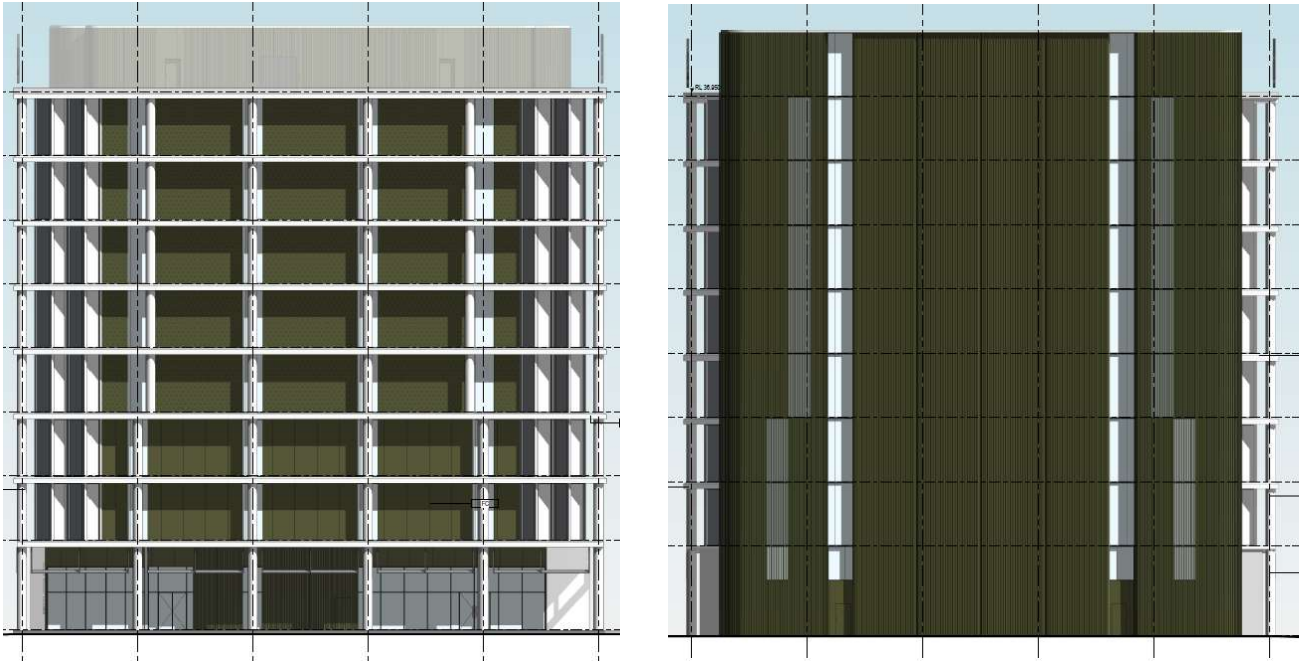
Northern elevation (left) and southern elevation to Ricketty Street (right) elevation of self-storage building [supplied by applicant]
